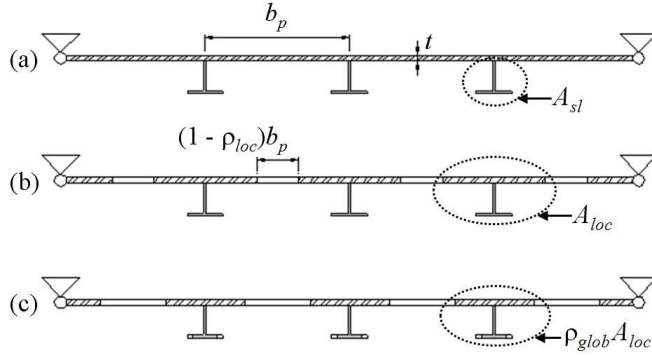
Reduction of the cross-sectional area of a stiffened plate in the design proposal: (a) the gross cross-sectional area, (b) the effective local cross-sectional area and (c) the effective cross-sectional area.
